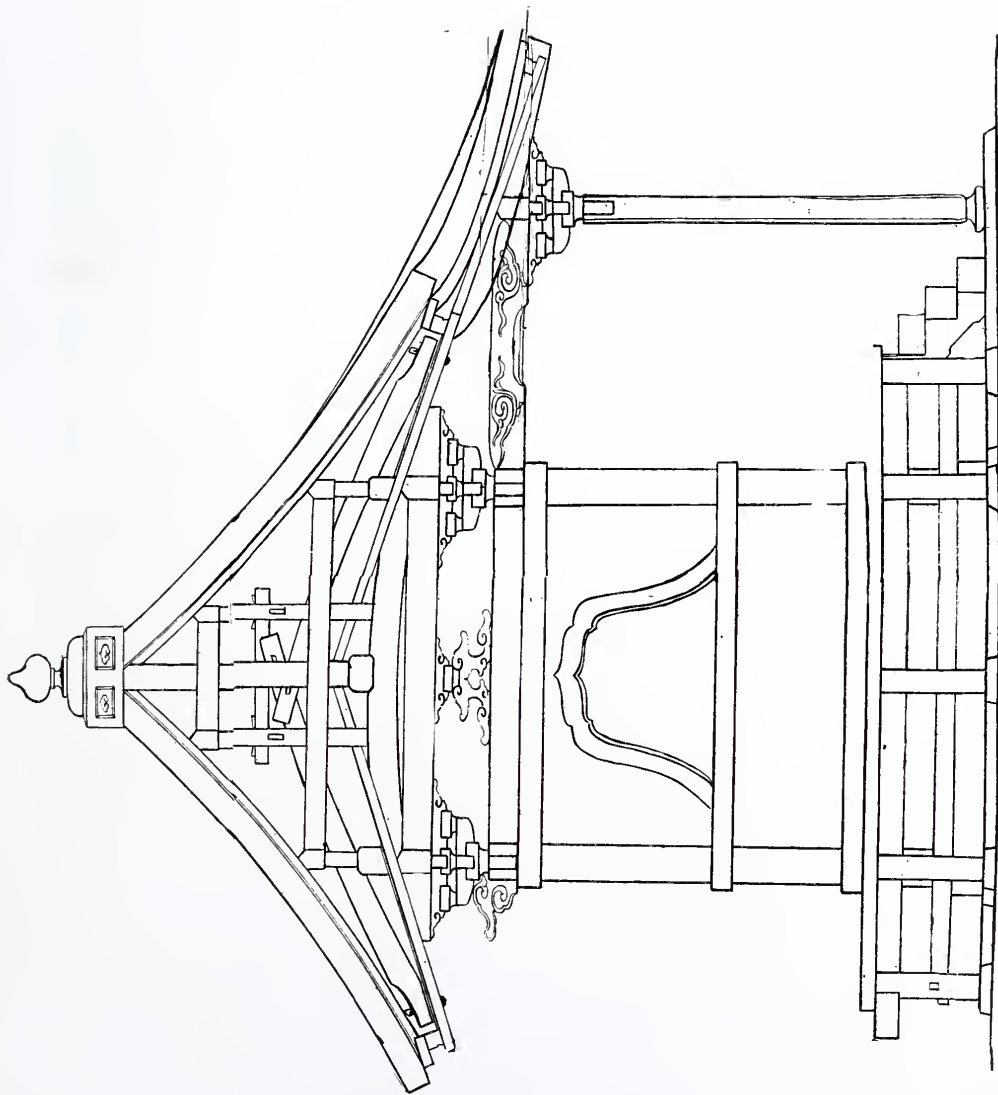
WORKING DRAWING, SHOWING THE ELABORATE CONSTRUCTION OF THE HEAVY ROOF. THE BRACES AND POSTS SUPPORTING THE VERANDA ROOF ARE ESPECIALLY WORTHY OF NOTICE.
